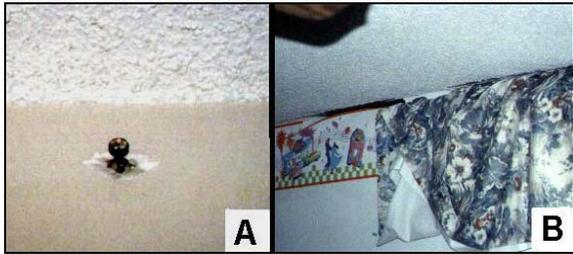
Tornado related damage to gypsum board: A) protruding nail in wall and B) separation of ceiling/wall joint as roof was uplifted (note drapery caught in joint).
